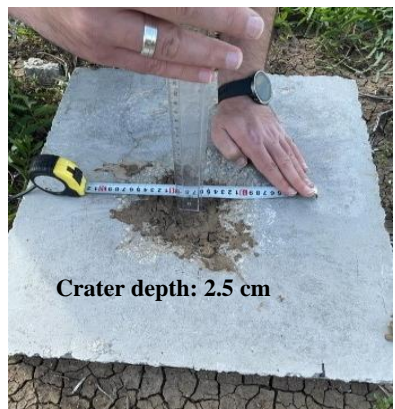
The crater depth of 5% CFGC exploded with 100 g TNG.
